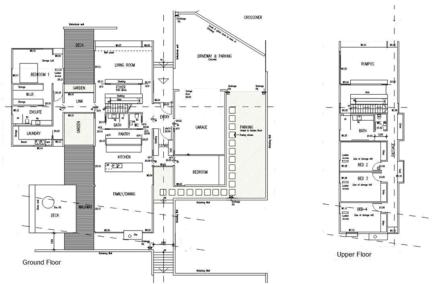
Ground and Upper floors (Preston Lane, 2021)
